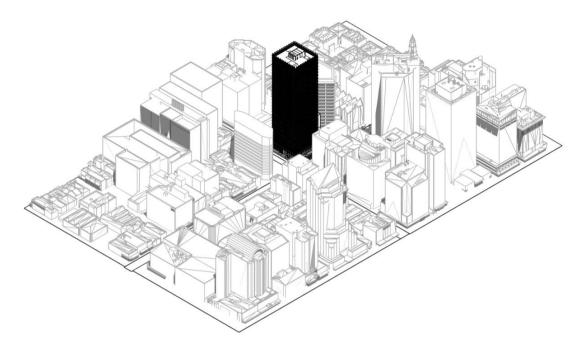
Isometric image showing location of proposed building (Image courtesy of GHD WOODHEAD)
